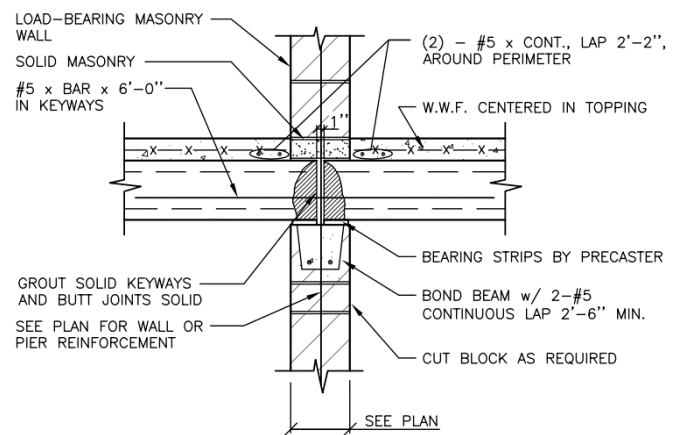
Precast Plank Bearing on Masonry Shear Wall (S12.20 Drawing 10)
